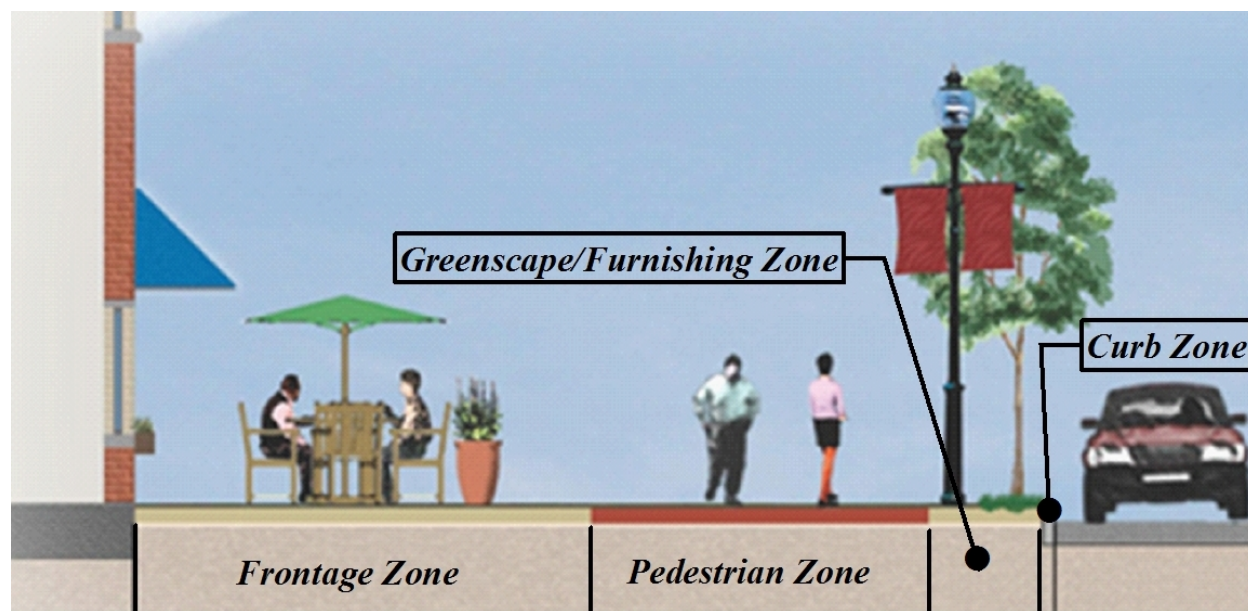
Proposed Dorchester Avenue concept, Illustrating the Four Sidewalk Zones
